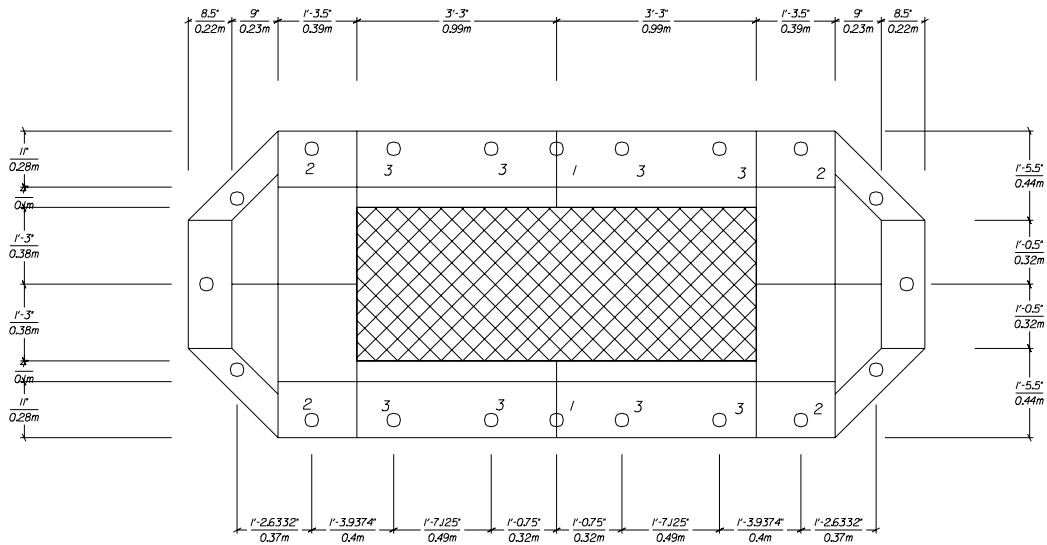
Cross Section Fiber Model for Piers 6-9
